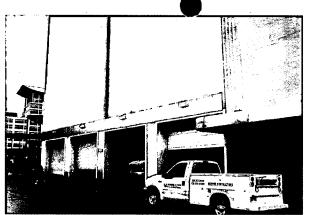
View of existing area which is currently under construction. Proposed site is at right of photo.
